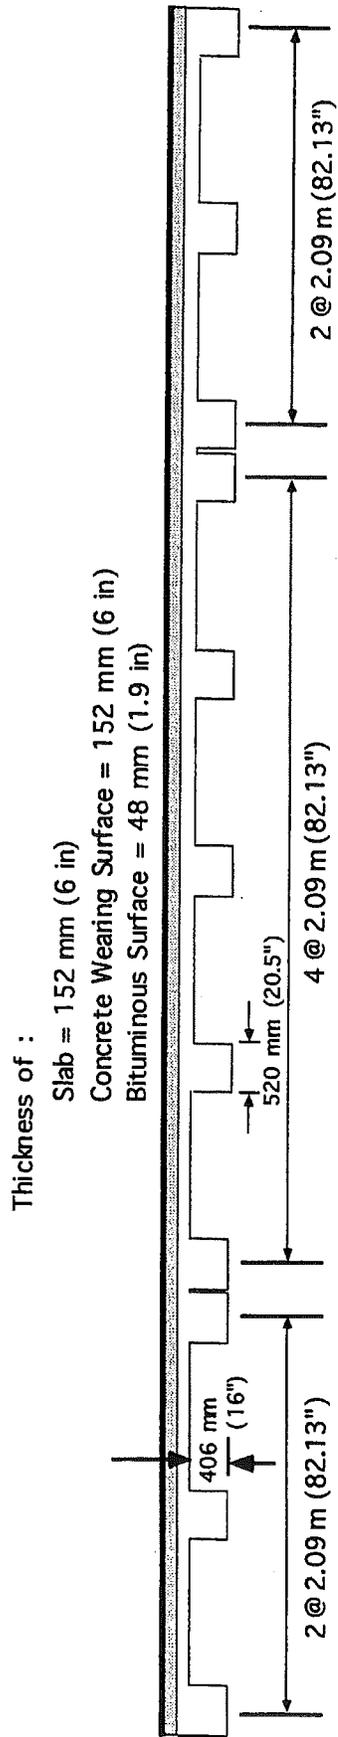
Cross-Section of Bridge No. 5 - Older Part.
